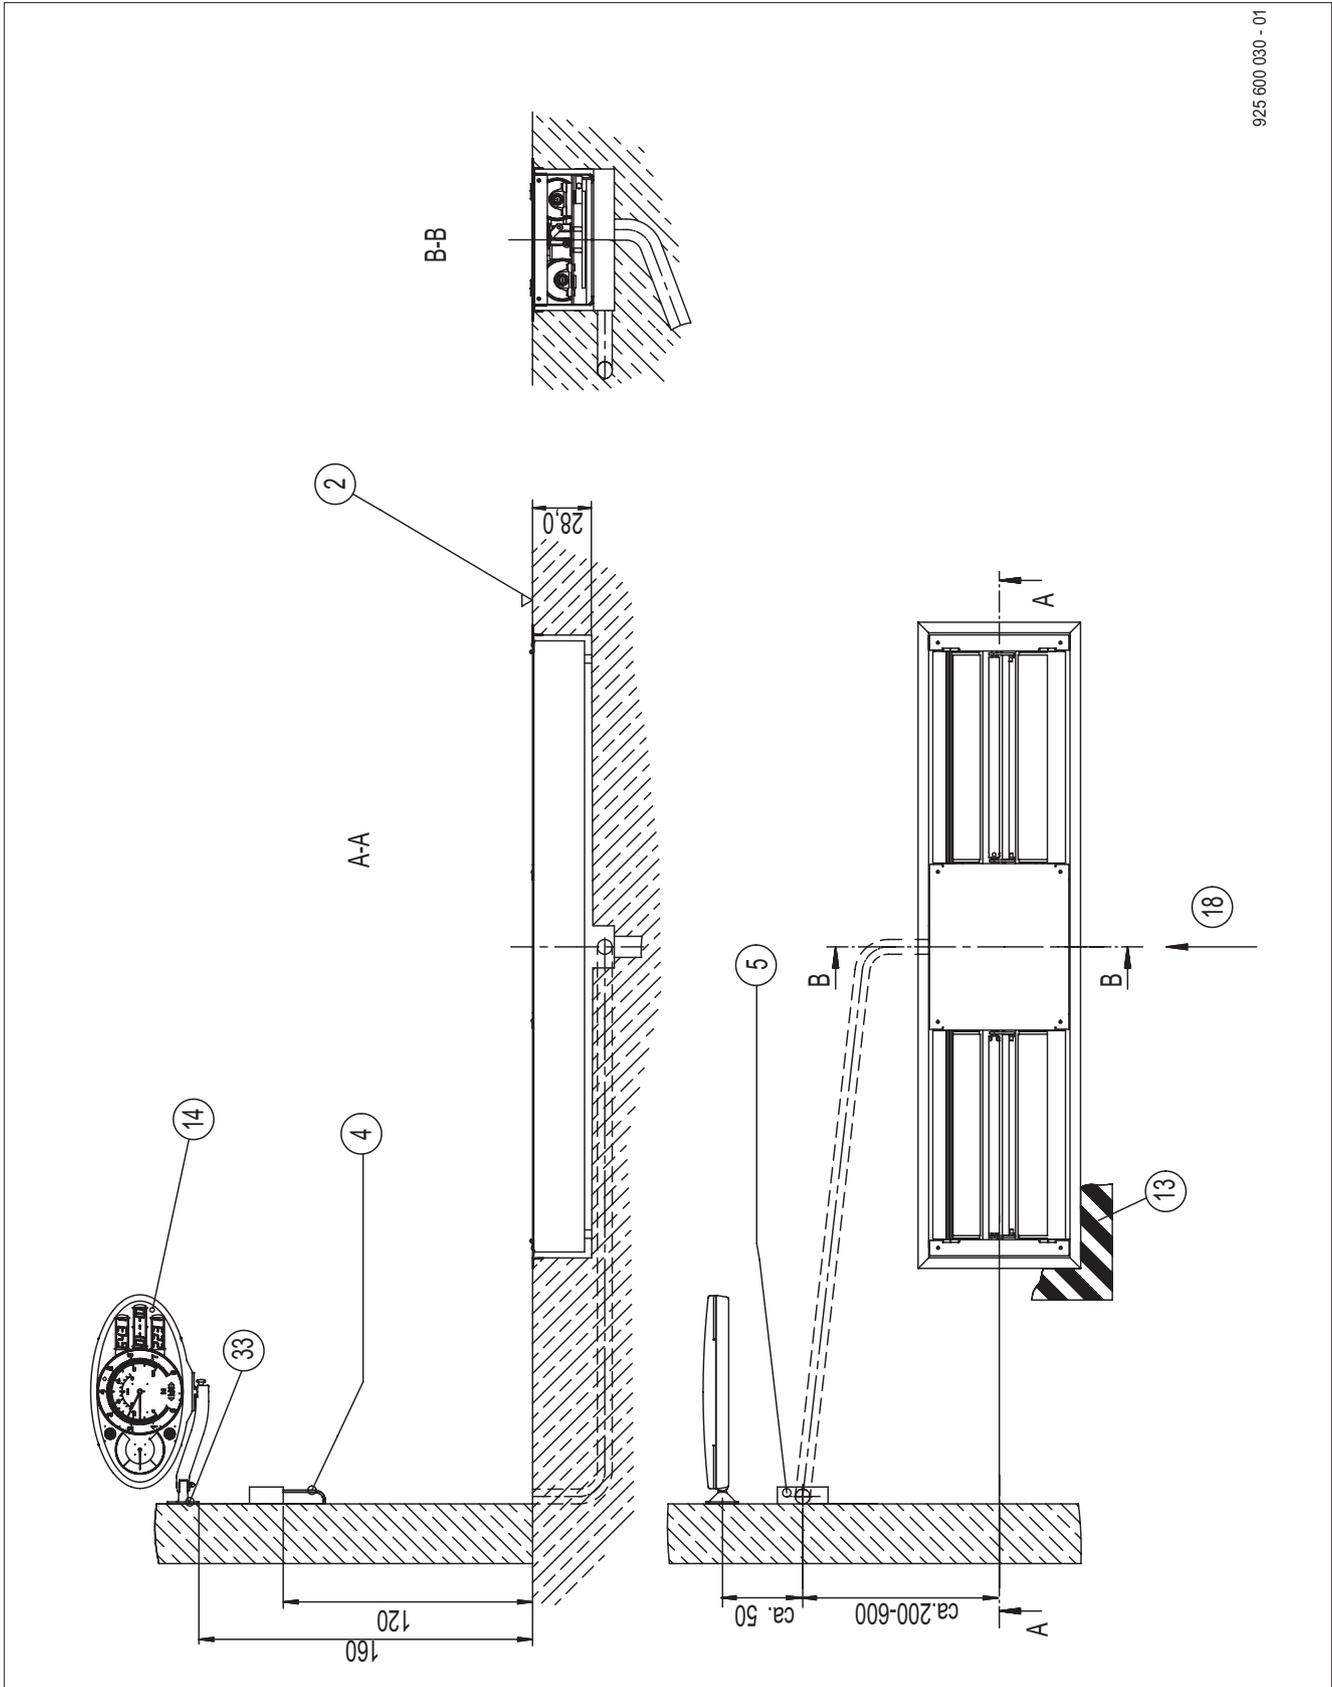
Plan of Pit BD 660 with wall bracket - Sectional view B-B
